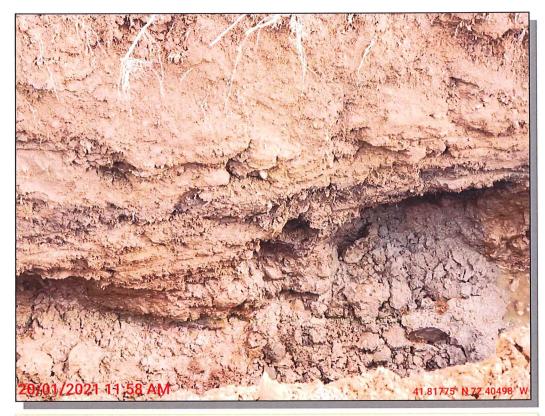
Soil Test Pit #2; showing dense saturated till (gray)
